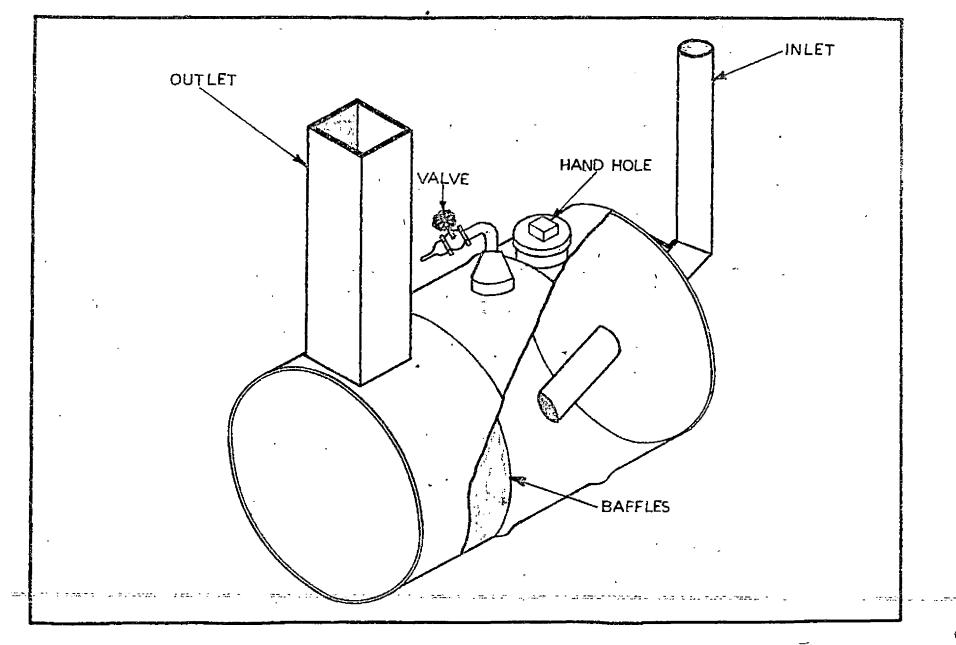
PILOT PLANT HORIZONTAL TYPE BIO-GAS PLANT
